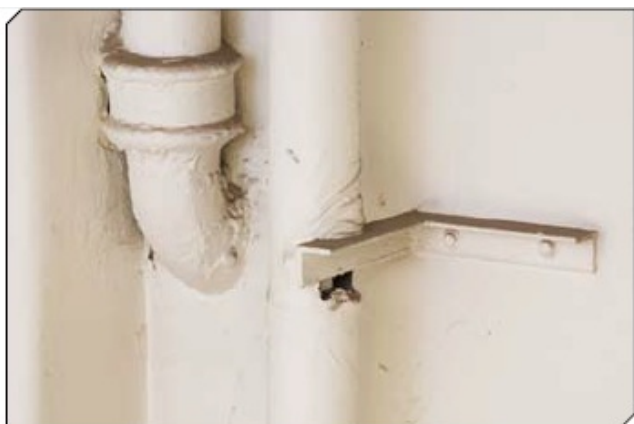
Damaged and exposed pipe wrapped with asbestos lagging.
